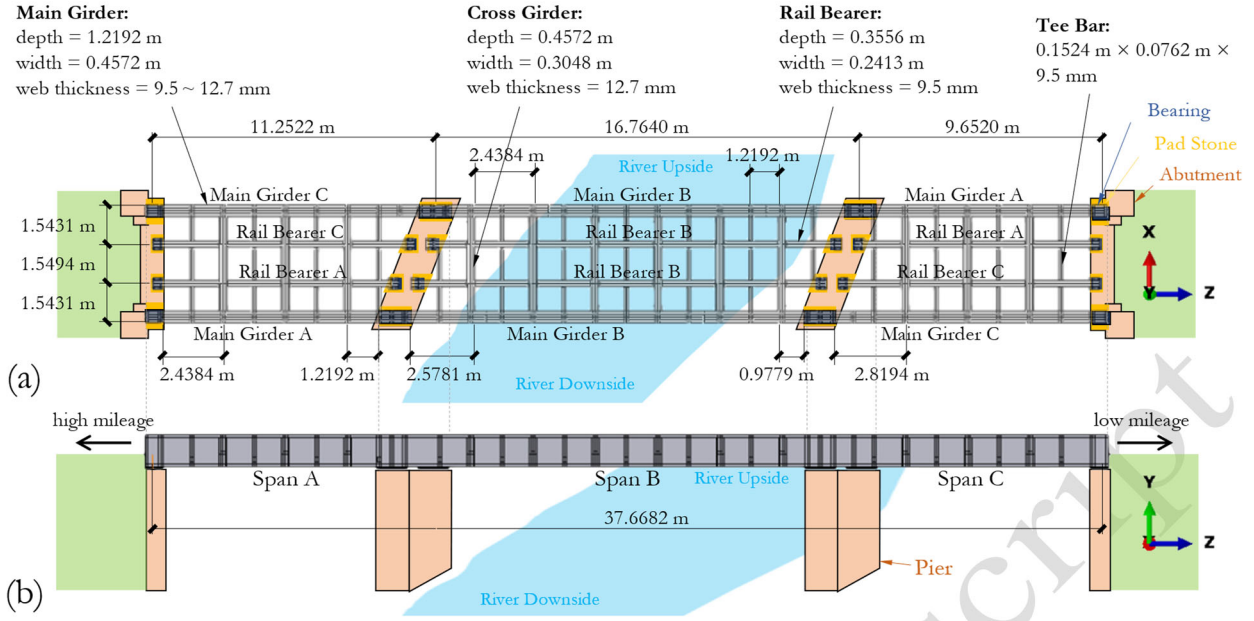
(a) Plan and (b) side view schematics of the case study railway bridge.
